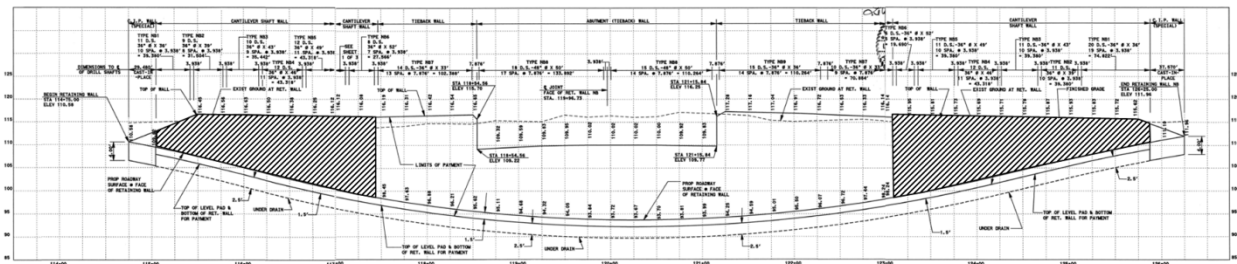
Composite sketch of northbound side of underpass. Shaded areas indicate locations of cantilever drilled shaft wall.
